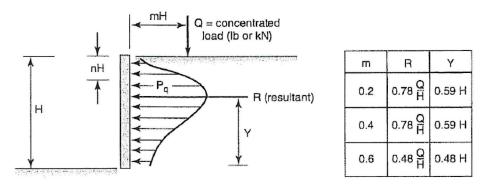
Pressure distribution against vertical wall resulting from point load, Q.
